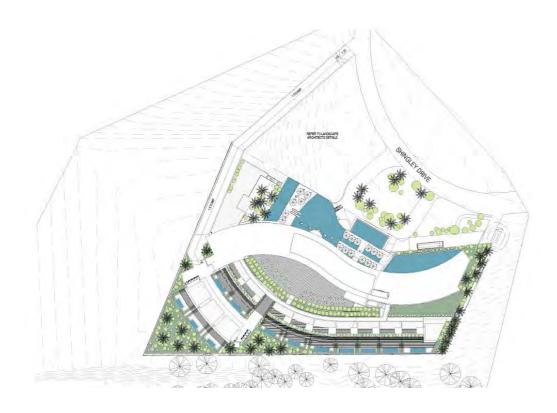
Proposed Development Site Plan . Source: DWA Architects
